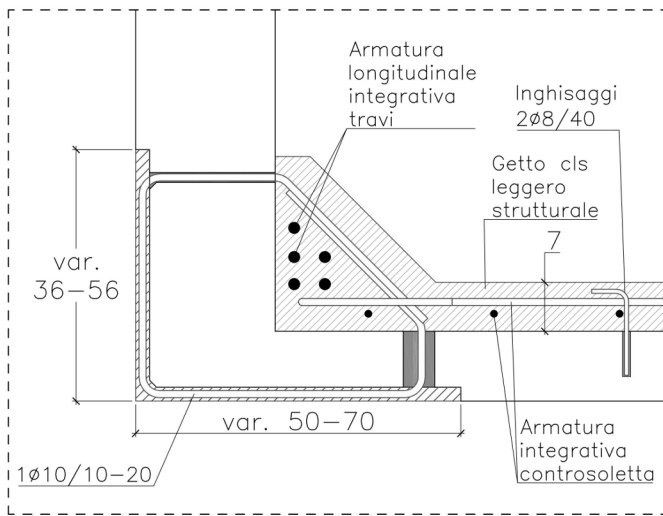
Reinforcements on the beams and counter-slab/ Rinforzi sulle travi e in controsoletta.
